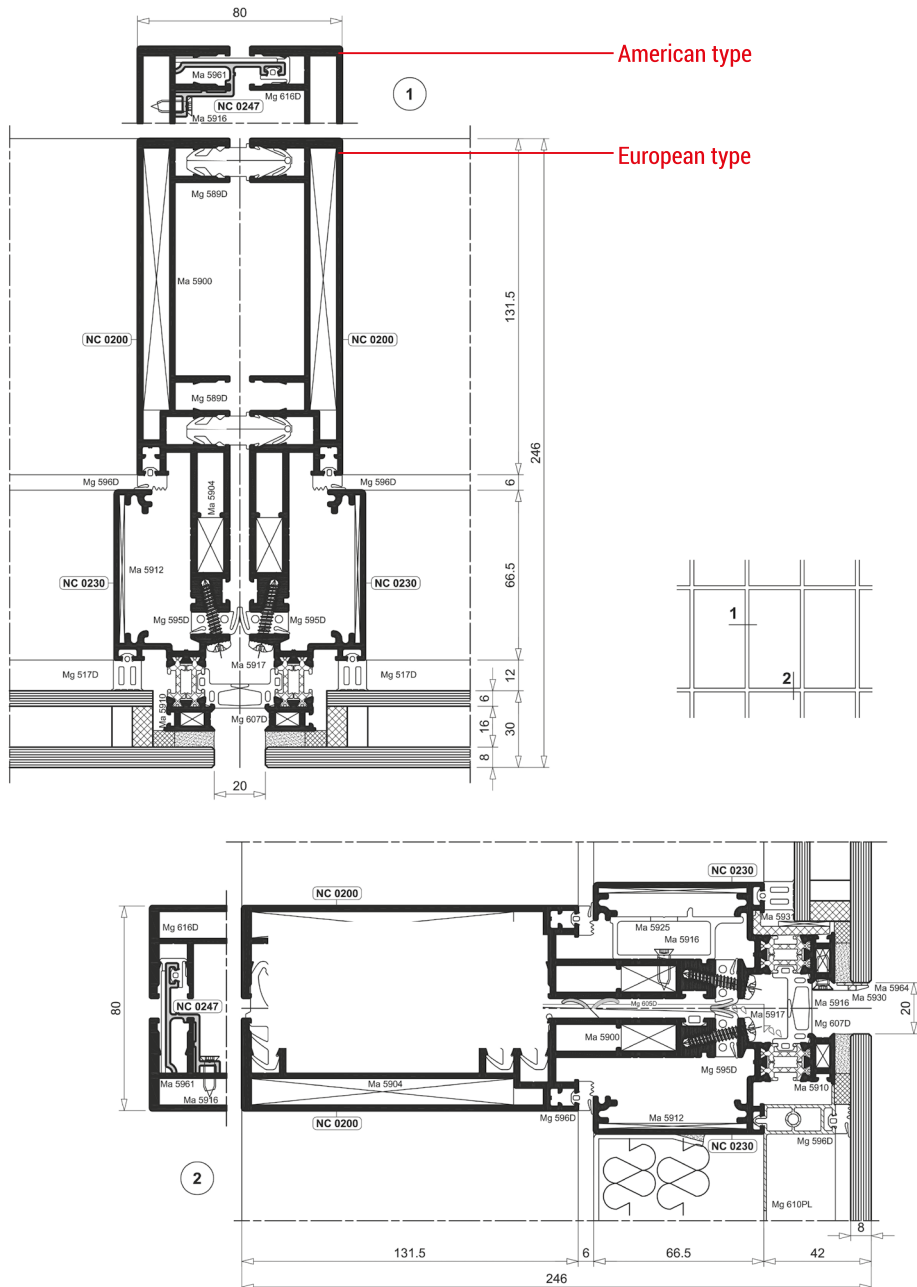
Cross-section of the mullion (on the left) and of the transom (on the right) of a unitised curtain wall system façades with bonded fixing. Note in the cross section the solution for the opaque infill panel (Source: The technical material in question is the property of METRA Spa)
